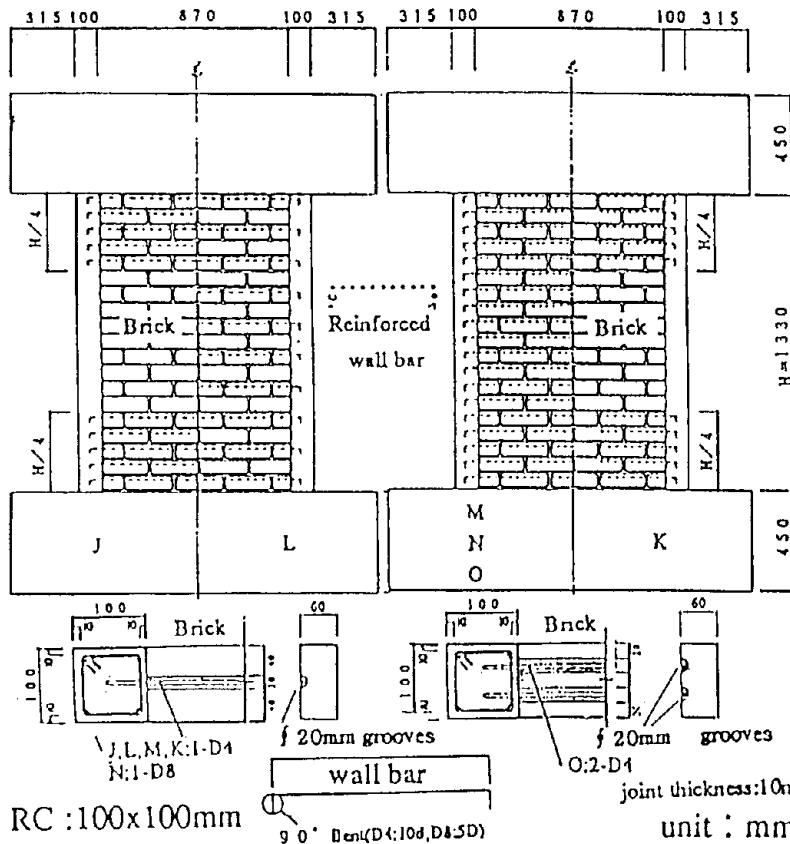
Specimens & Reinforcement Arrangement (Effects of Lateral Reinf. of Wall & Axial Stress)
